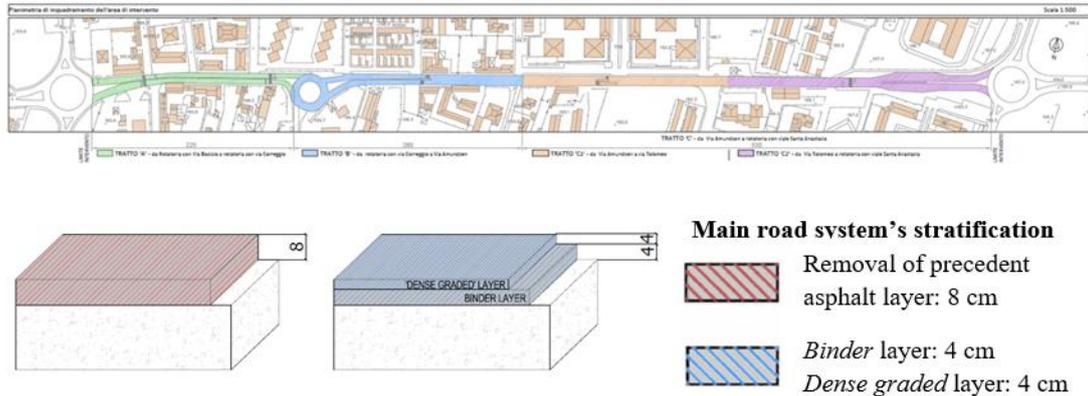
Detail of the design of low-noise pavement in Viale Libertà - Monza.
